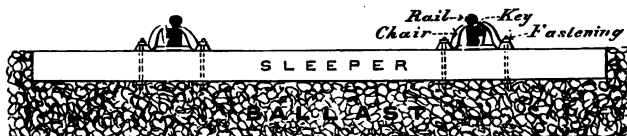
Cross section of a railway with double-headed rails in chairs.
